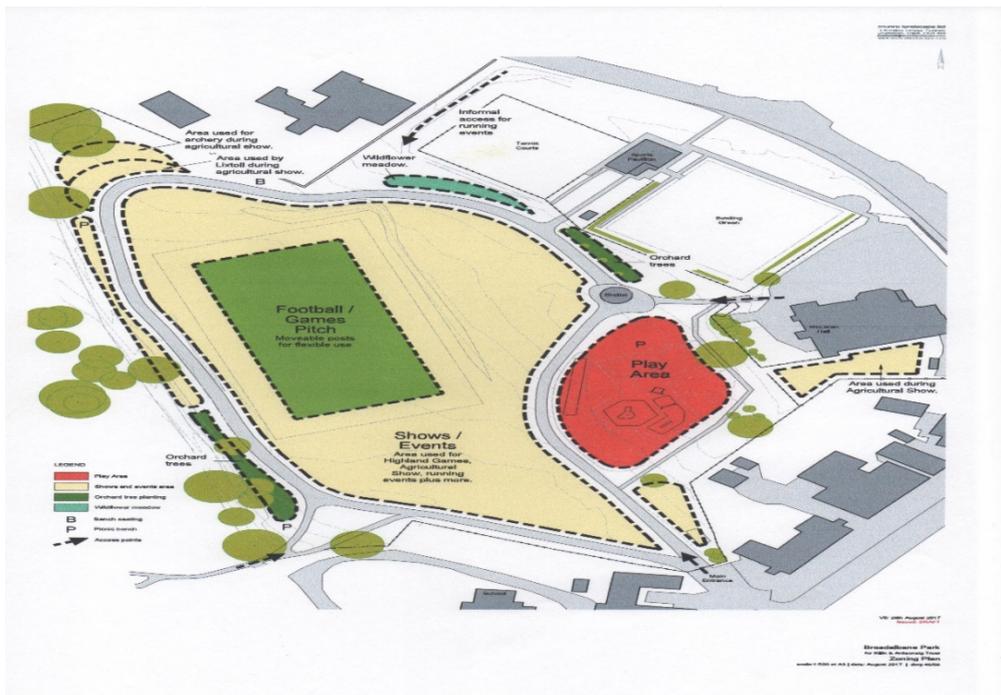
Park Concept Plan by Mumro Landscape Ltd
